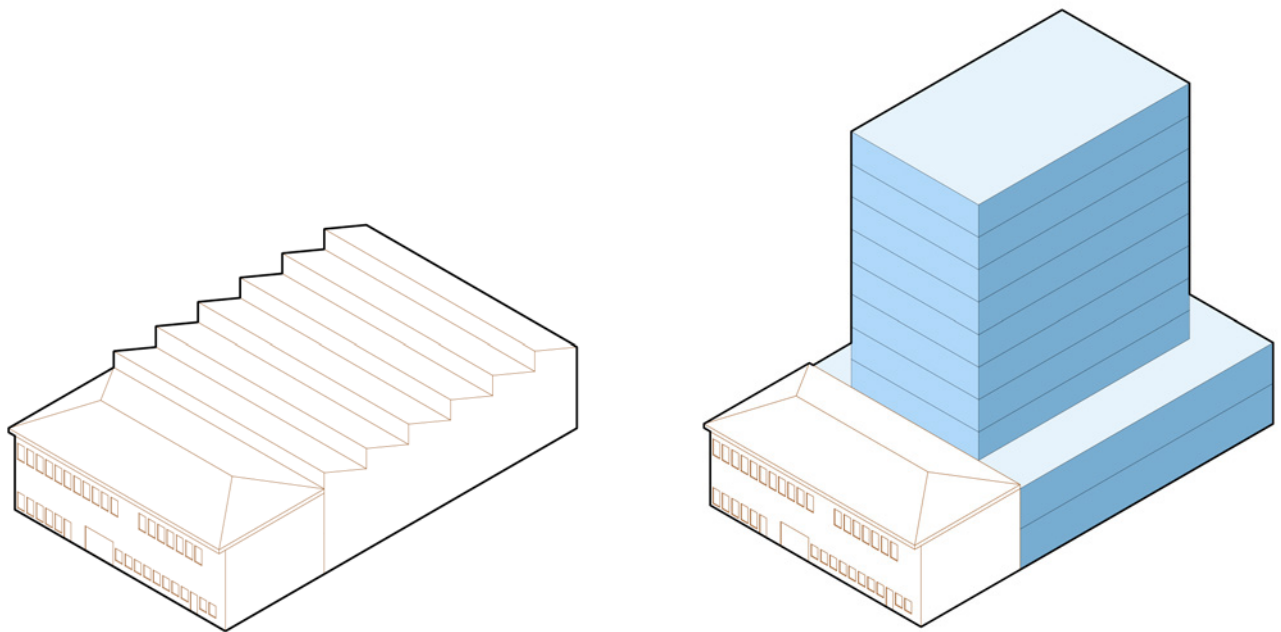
An example of an industrial heritage building with a distinct element to the street that fronts a sawtooth warehouse space. This approach avoids facadism by maintaining the front element which allows the facade and roof form to be read from the public realm. The new development can then occupy the remaining site area of the former sawtooth warehouse.
